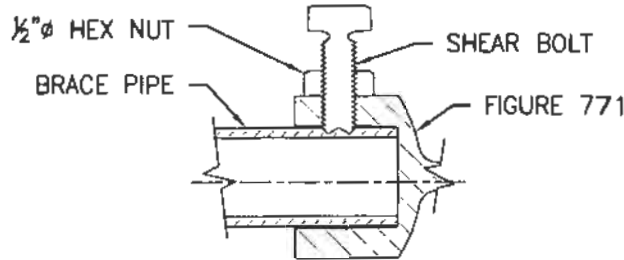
SHEAR BOLT - BRACE PIPE INTERACTION DETAIL
